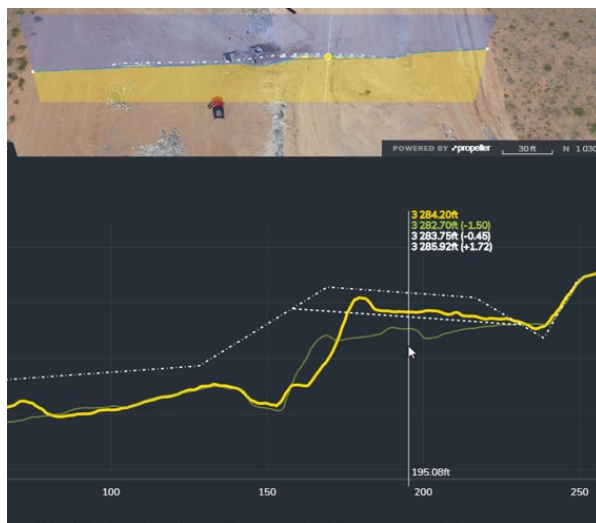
Construction phase cross-section views (Image courtesy of Utah DOT)
